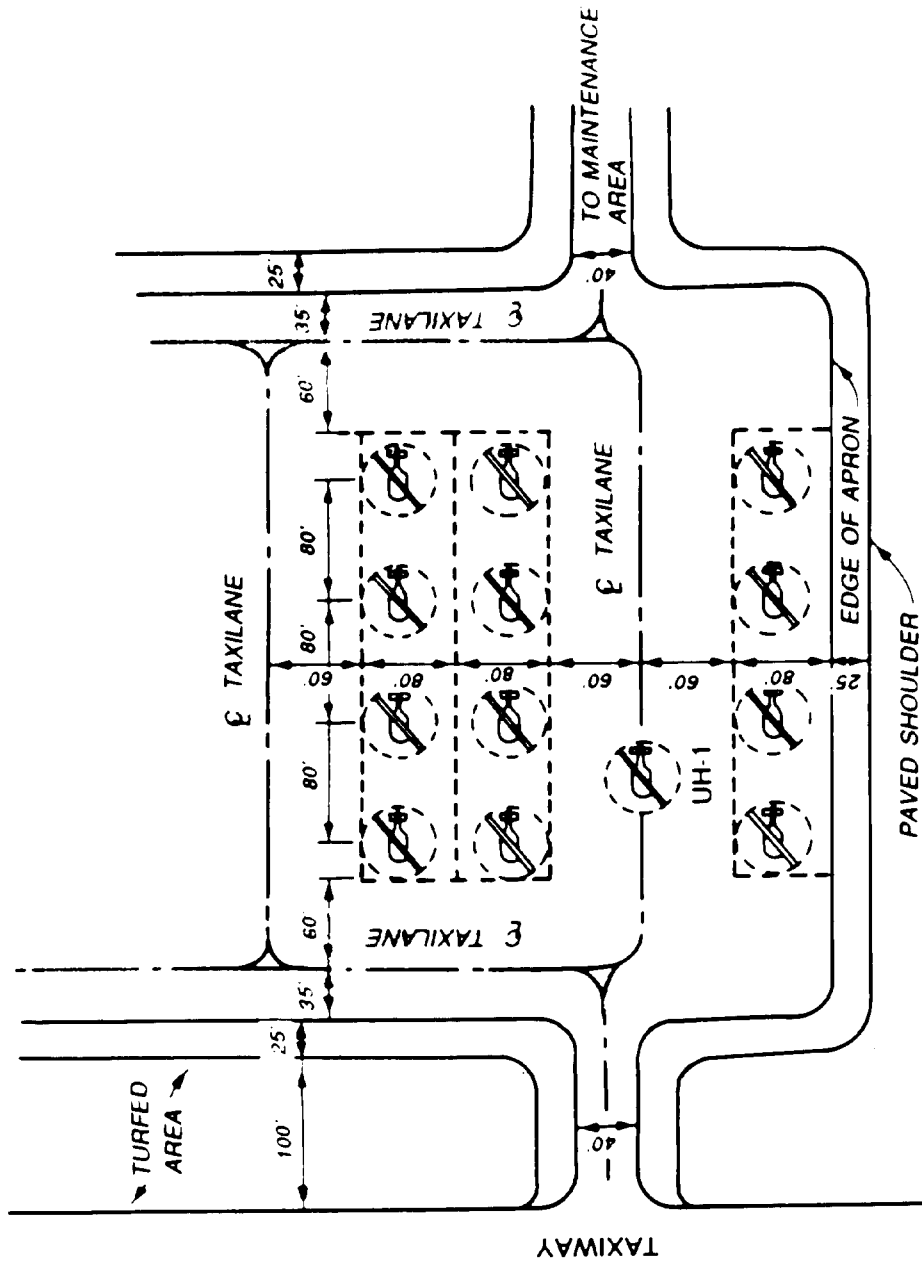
UH-1 Parking Plan, Type 2 (Double Parallel)
